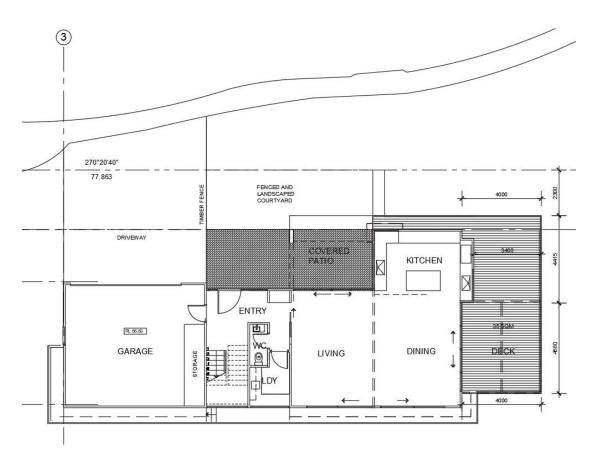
Floor plan of existing unit 1 indicating private open space dimensions.
